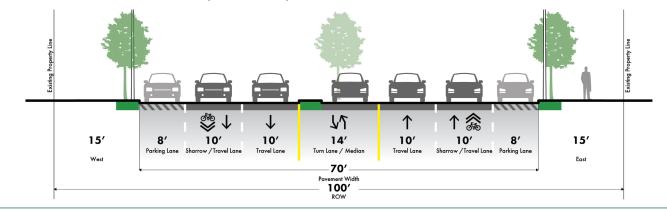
PARAMOUNT BOULEVARD BETWEEN ROSE STREET TO ROSECRANS AVENUE – PROPOSED CROSS SECTION (OPTION 2)
